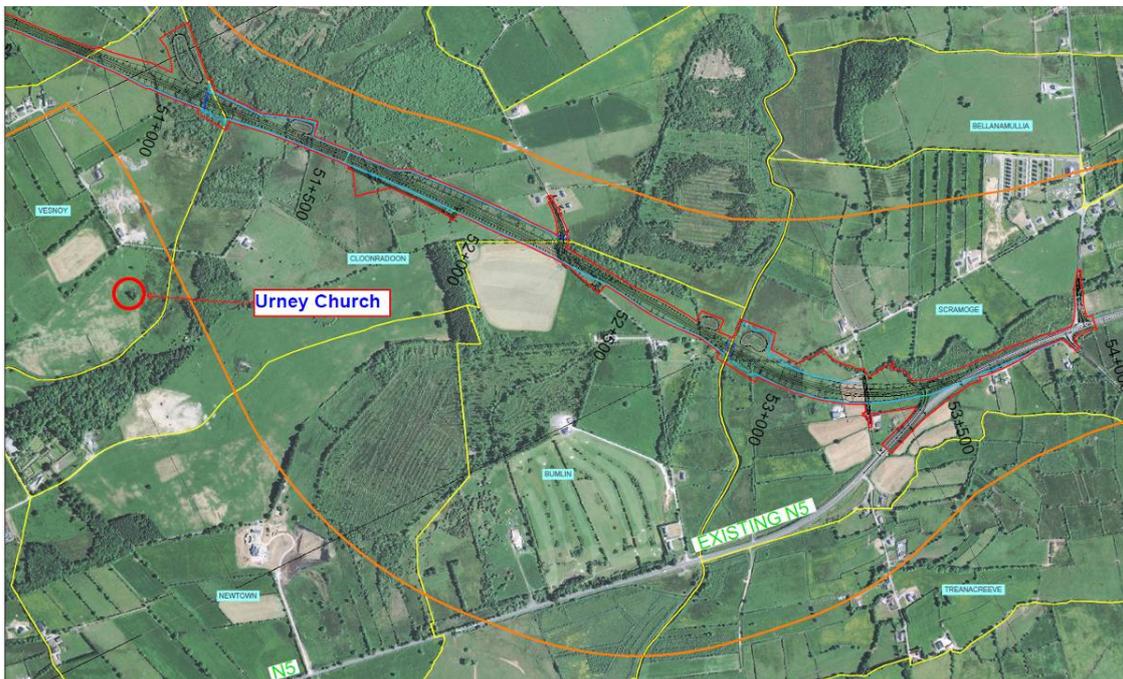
Draft Plan provided by Roughan & O'Donovan Consulting Engineers
